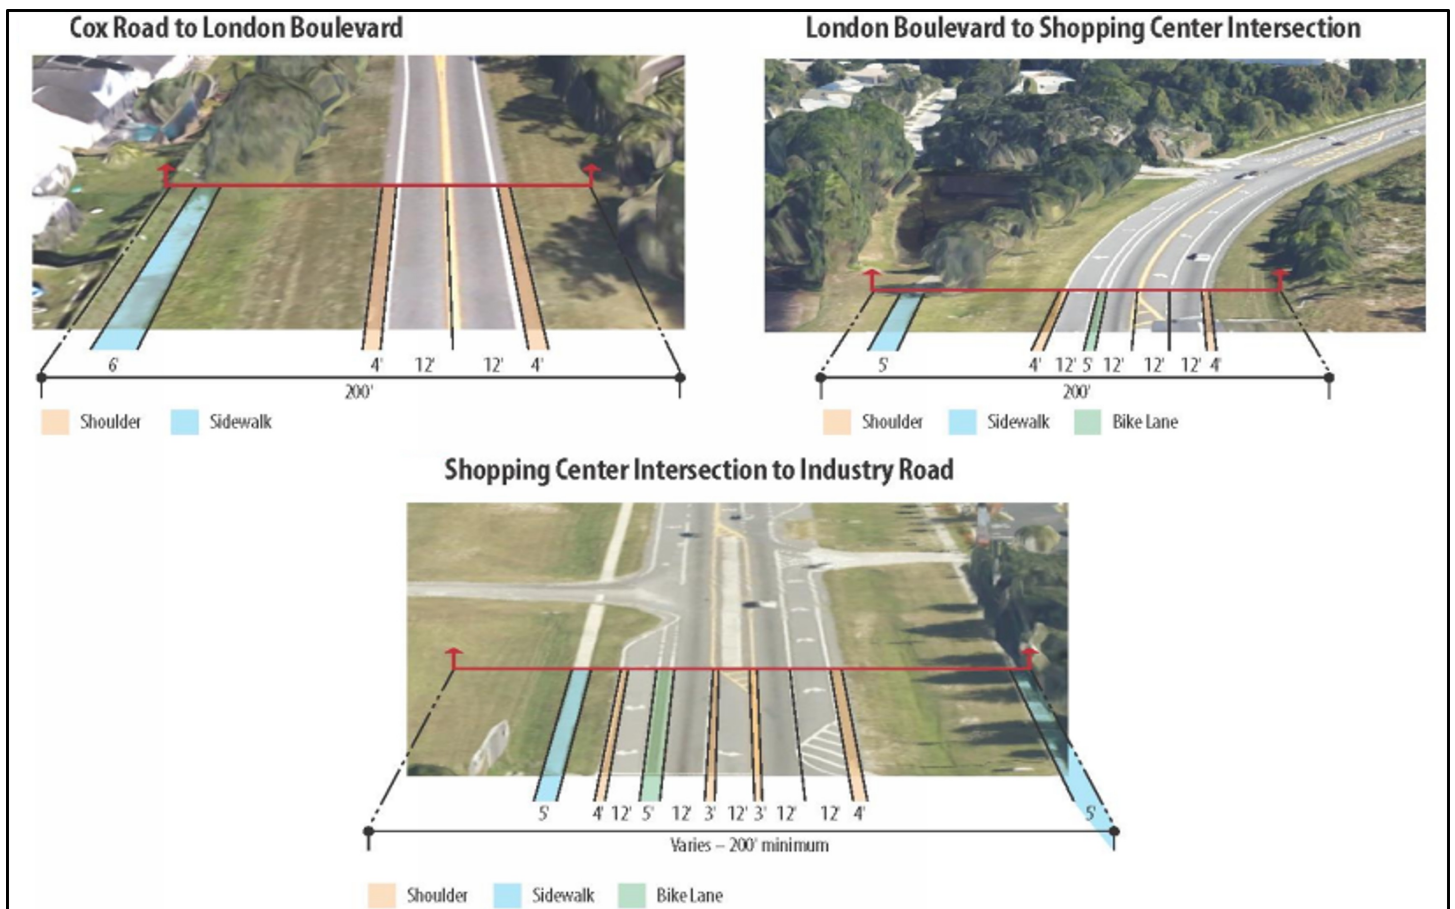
Existing SR 524 Typical Sections from Cox Road to Industry Road
